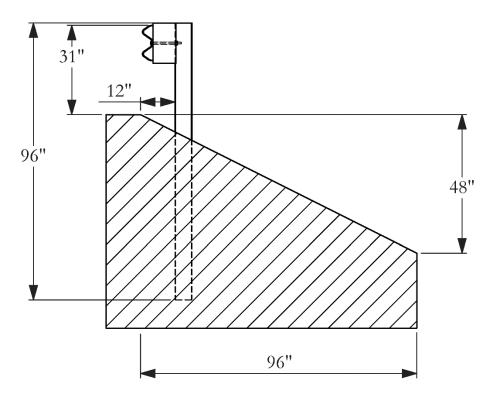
Cross Section of the Guardrail on Slope System Tested by Abu-Odeh et al. (3).
